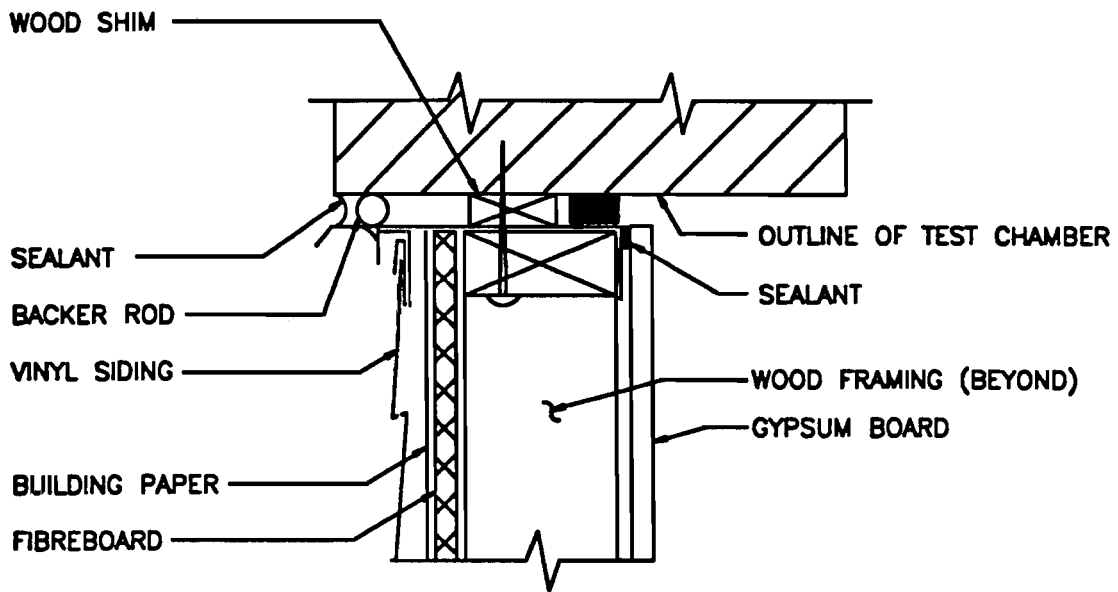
DETAIL OF JUNCTION BETWEEN WALL SAMPLE AND TEST CHAMBER
